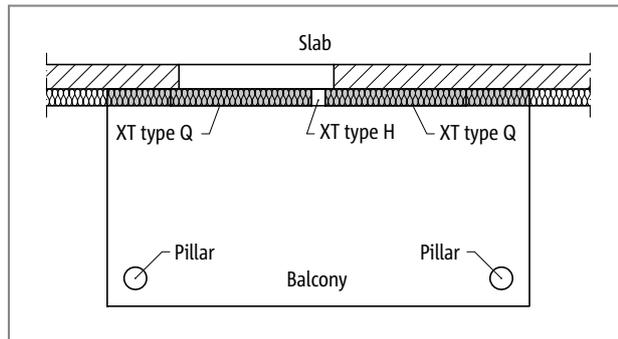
Schöck Isokorb® XT type Q: Balcony with column support
